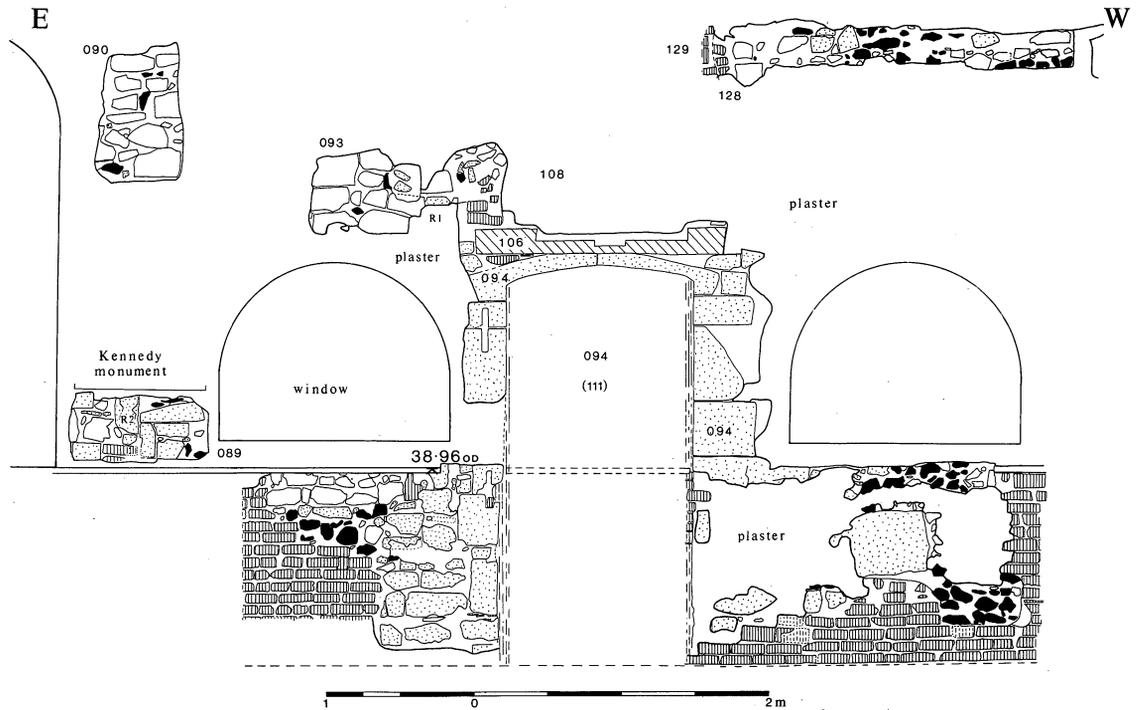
Carshalton Church: outer south aisle interior, south wall, middle bay, elevation. For key diagram see fig 5.
